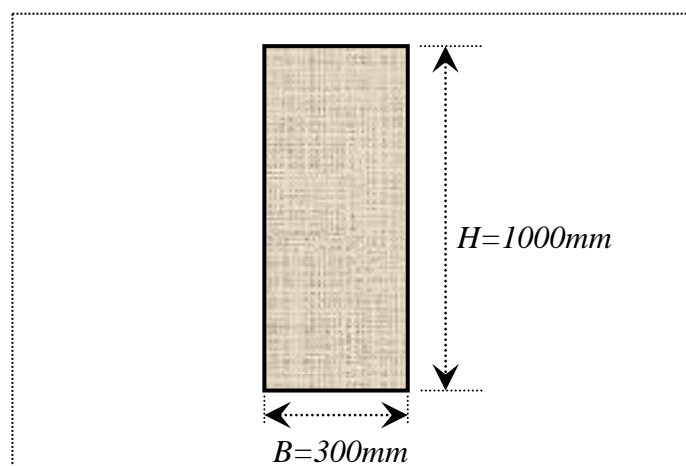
Typical cross sectional dimensions of cast in situ cross diaphragm
